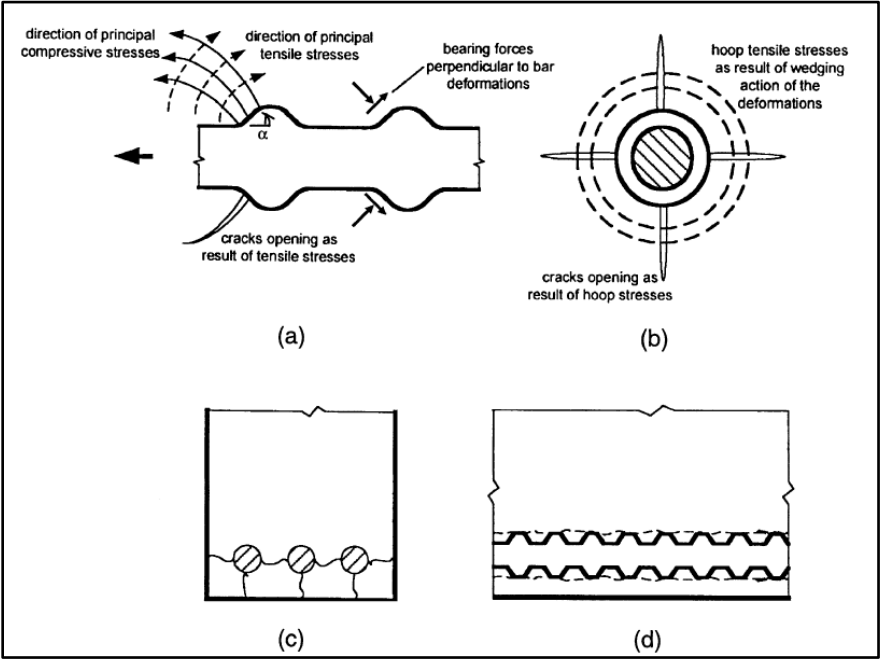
Cracking and damage mechanisms in bond (ACI, 2003).
